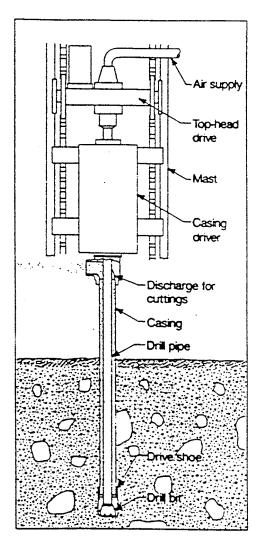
Casing Drivers can be Fitted to Top-Head Drive Rotary Rigs to Simultaneously Drill and Drive Casing
